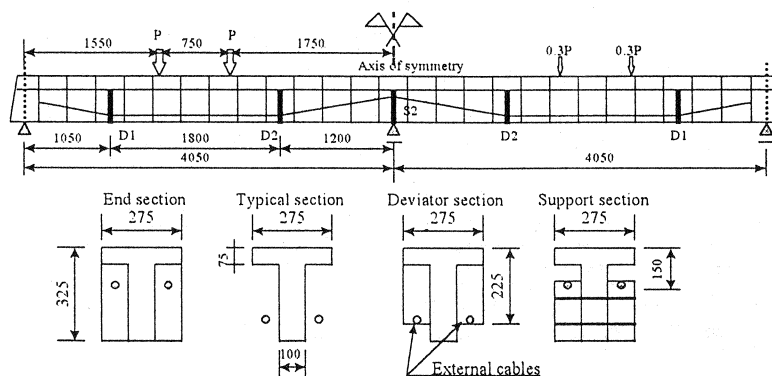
Layout scheme of two span continuous beam (Dimension in mm)
